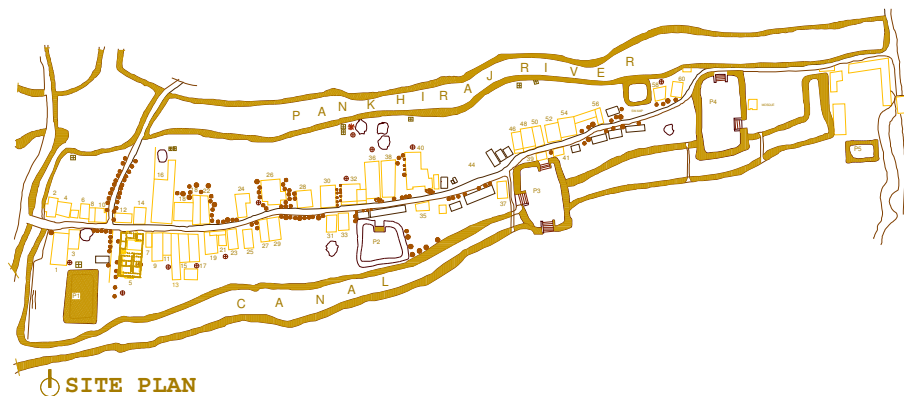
The Existing Master Plan of Panam showing the sixty buildings.
